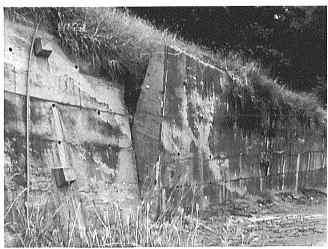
Tilting of gravity type retaining wall neighboring undamaged anchored retaining wall (at an embankment along District Road No. 129; site 2 in Fig. 1)
